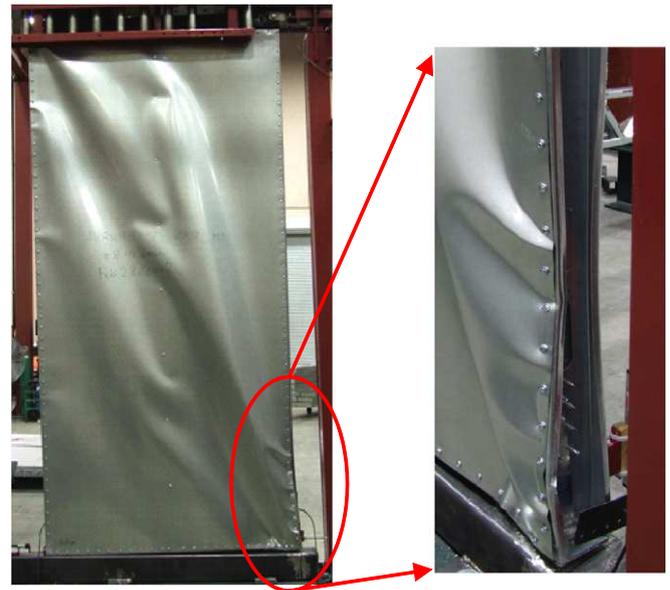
Sheathing buckling and stud flange distortion on a 2.44 m x 1.22 m wall in monotonic test.
